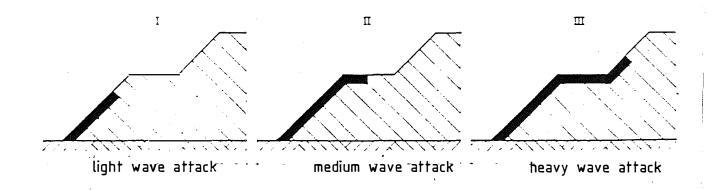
Possible termination of the hardened revetment at an outer berm situated at design level.
